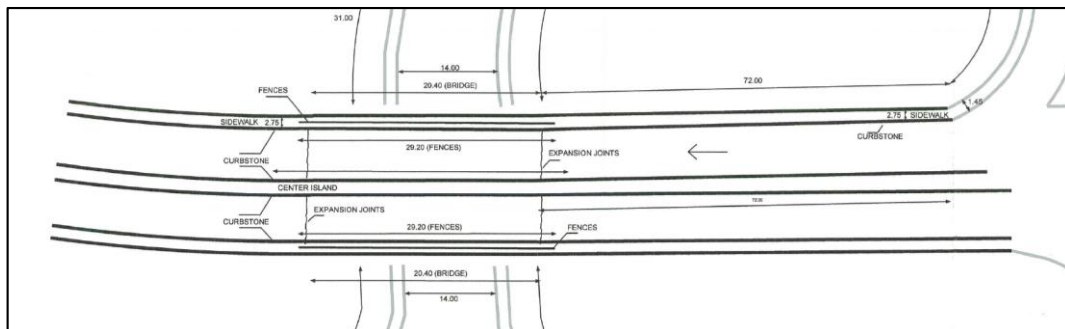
Layout of elements that have to be repair (expansion joints, curbs, and fence)
